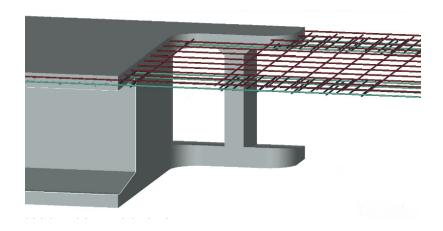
Integral Bent Cap Top Slab Reinforcement
